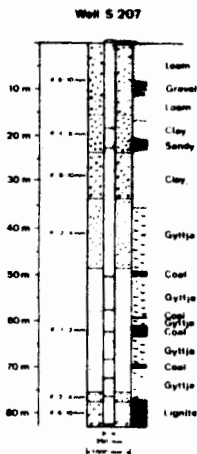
Typical Design of a Dewatering Well in the Overburden.
